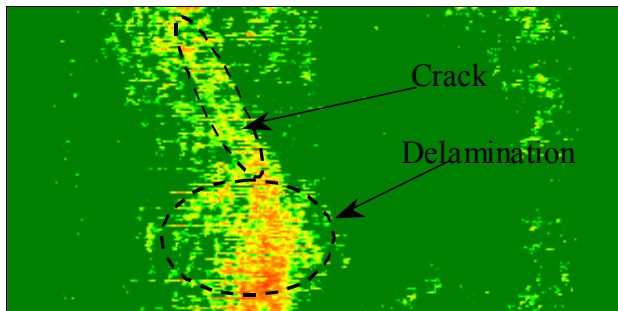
C-scan image of a FRP/Concrete sample showing a delamination inside the FRP and a crack in the concrete below the FRP wrap.
